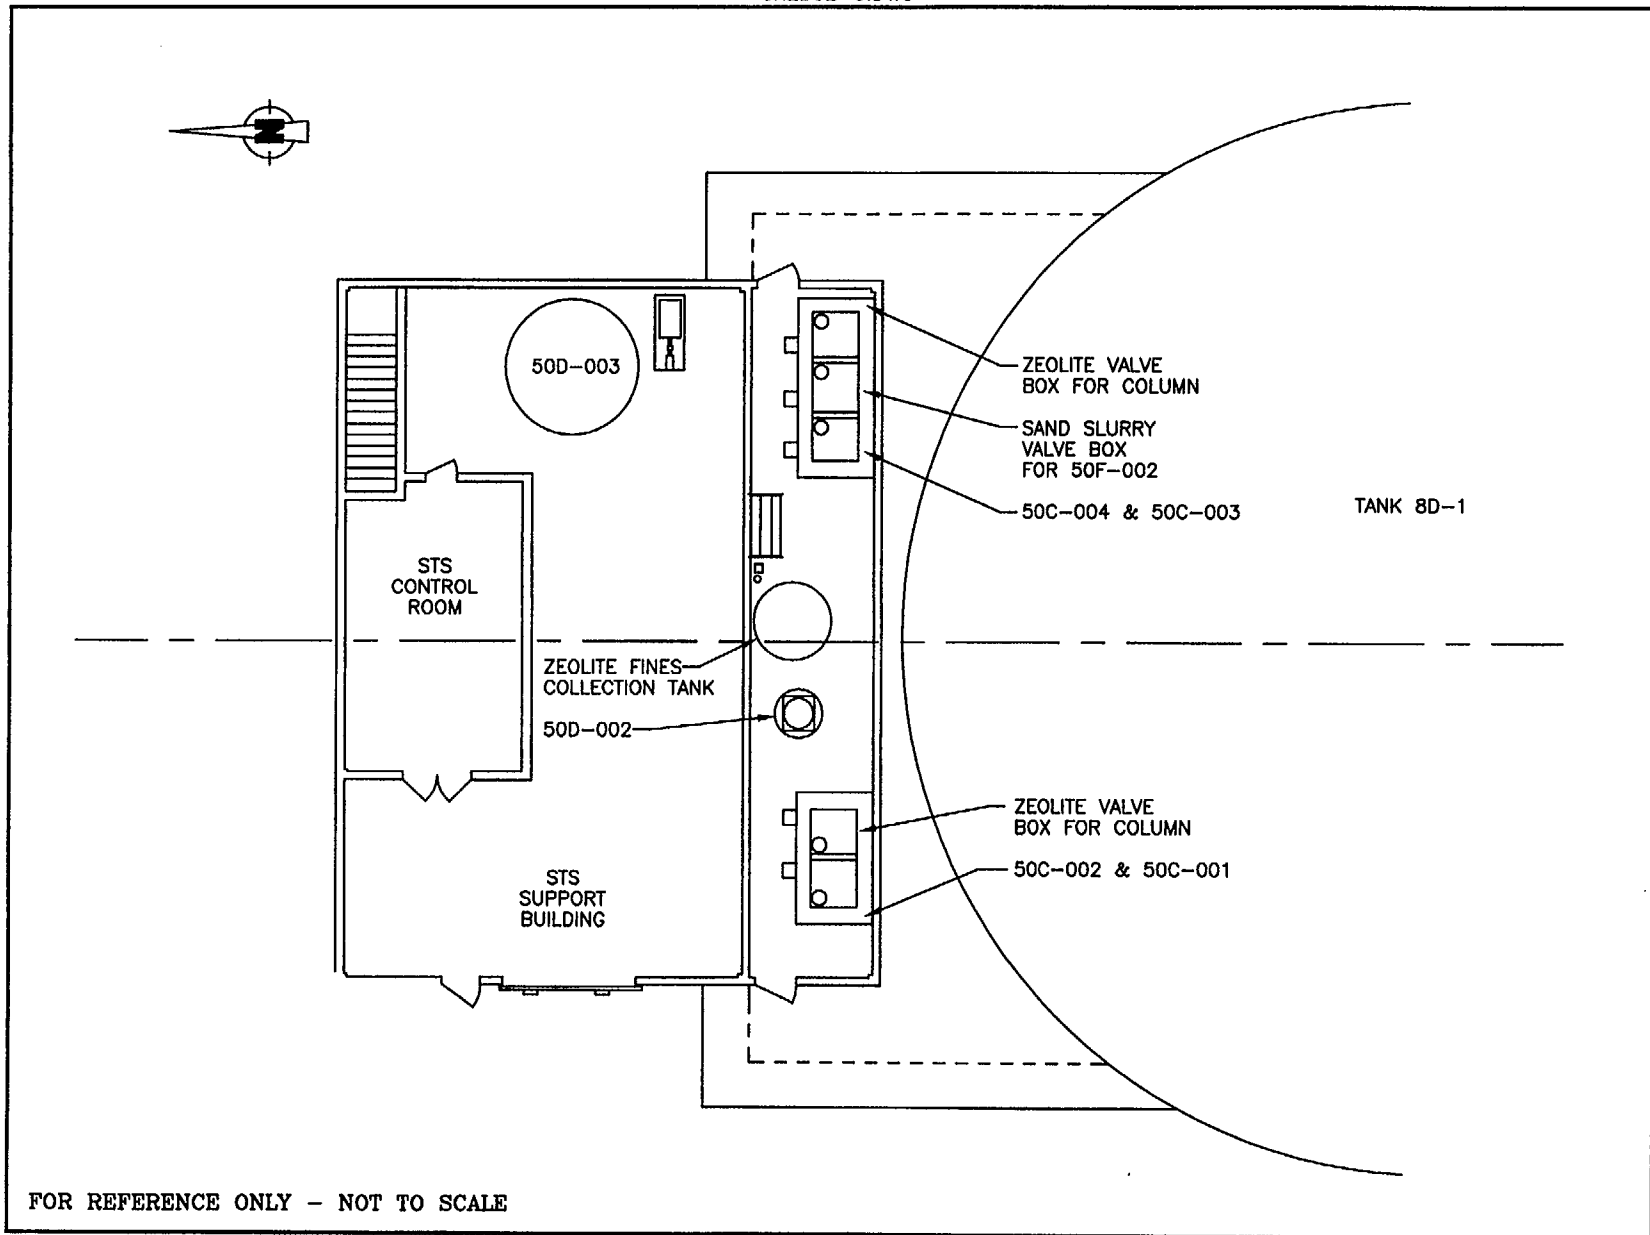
General Arrangement STS Building - Plan Elevation 107.0'
